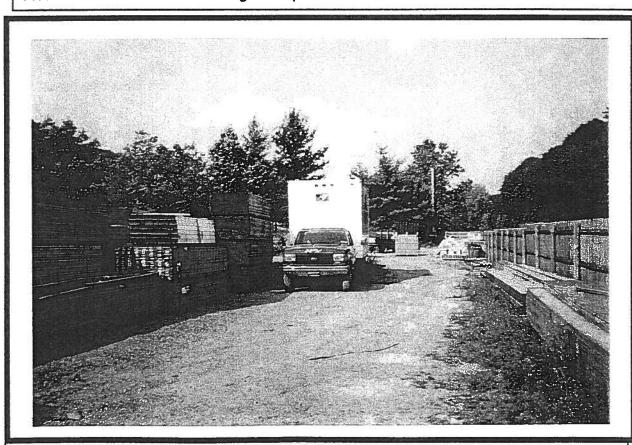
Stockade Fence Storage Area (Photo 2 of 2)
